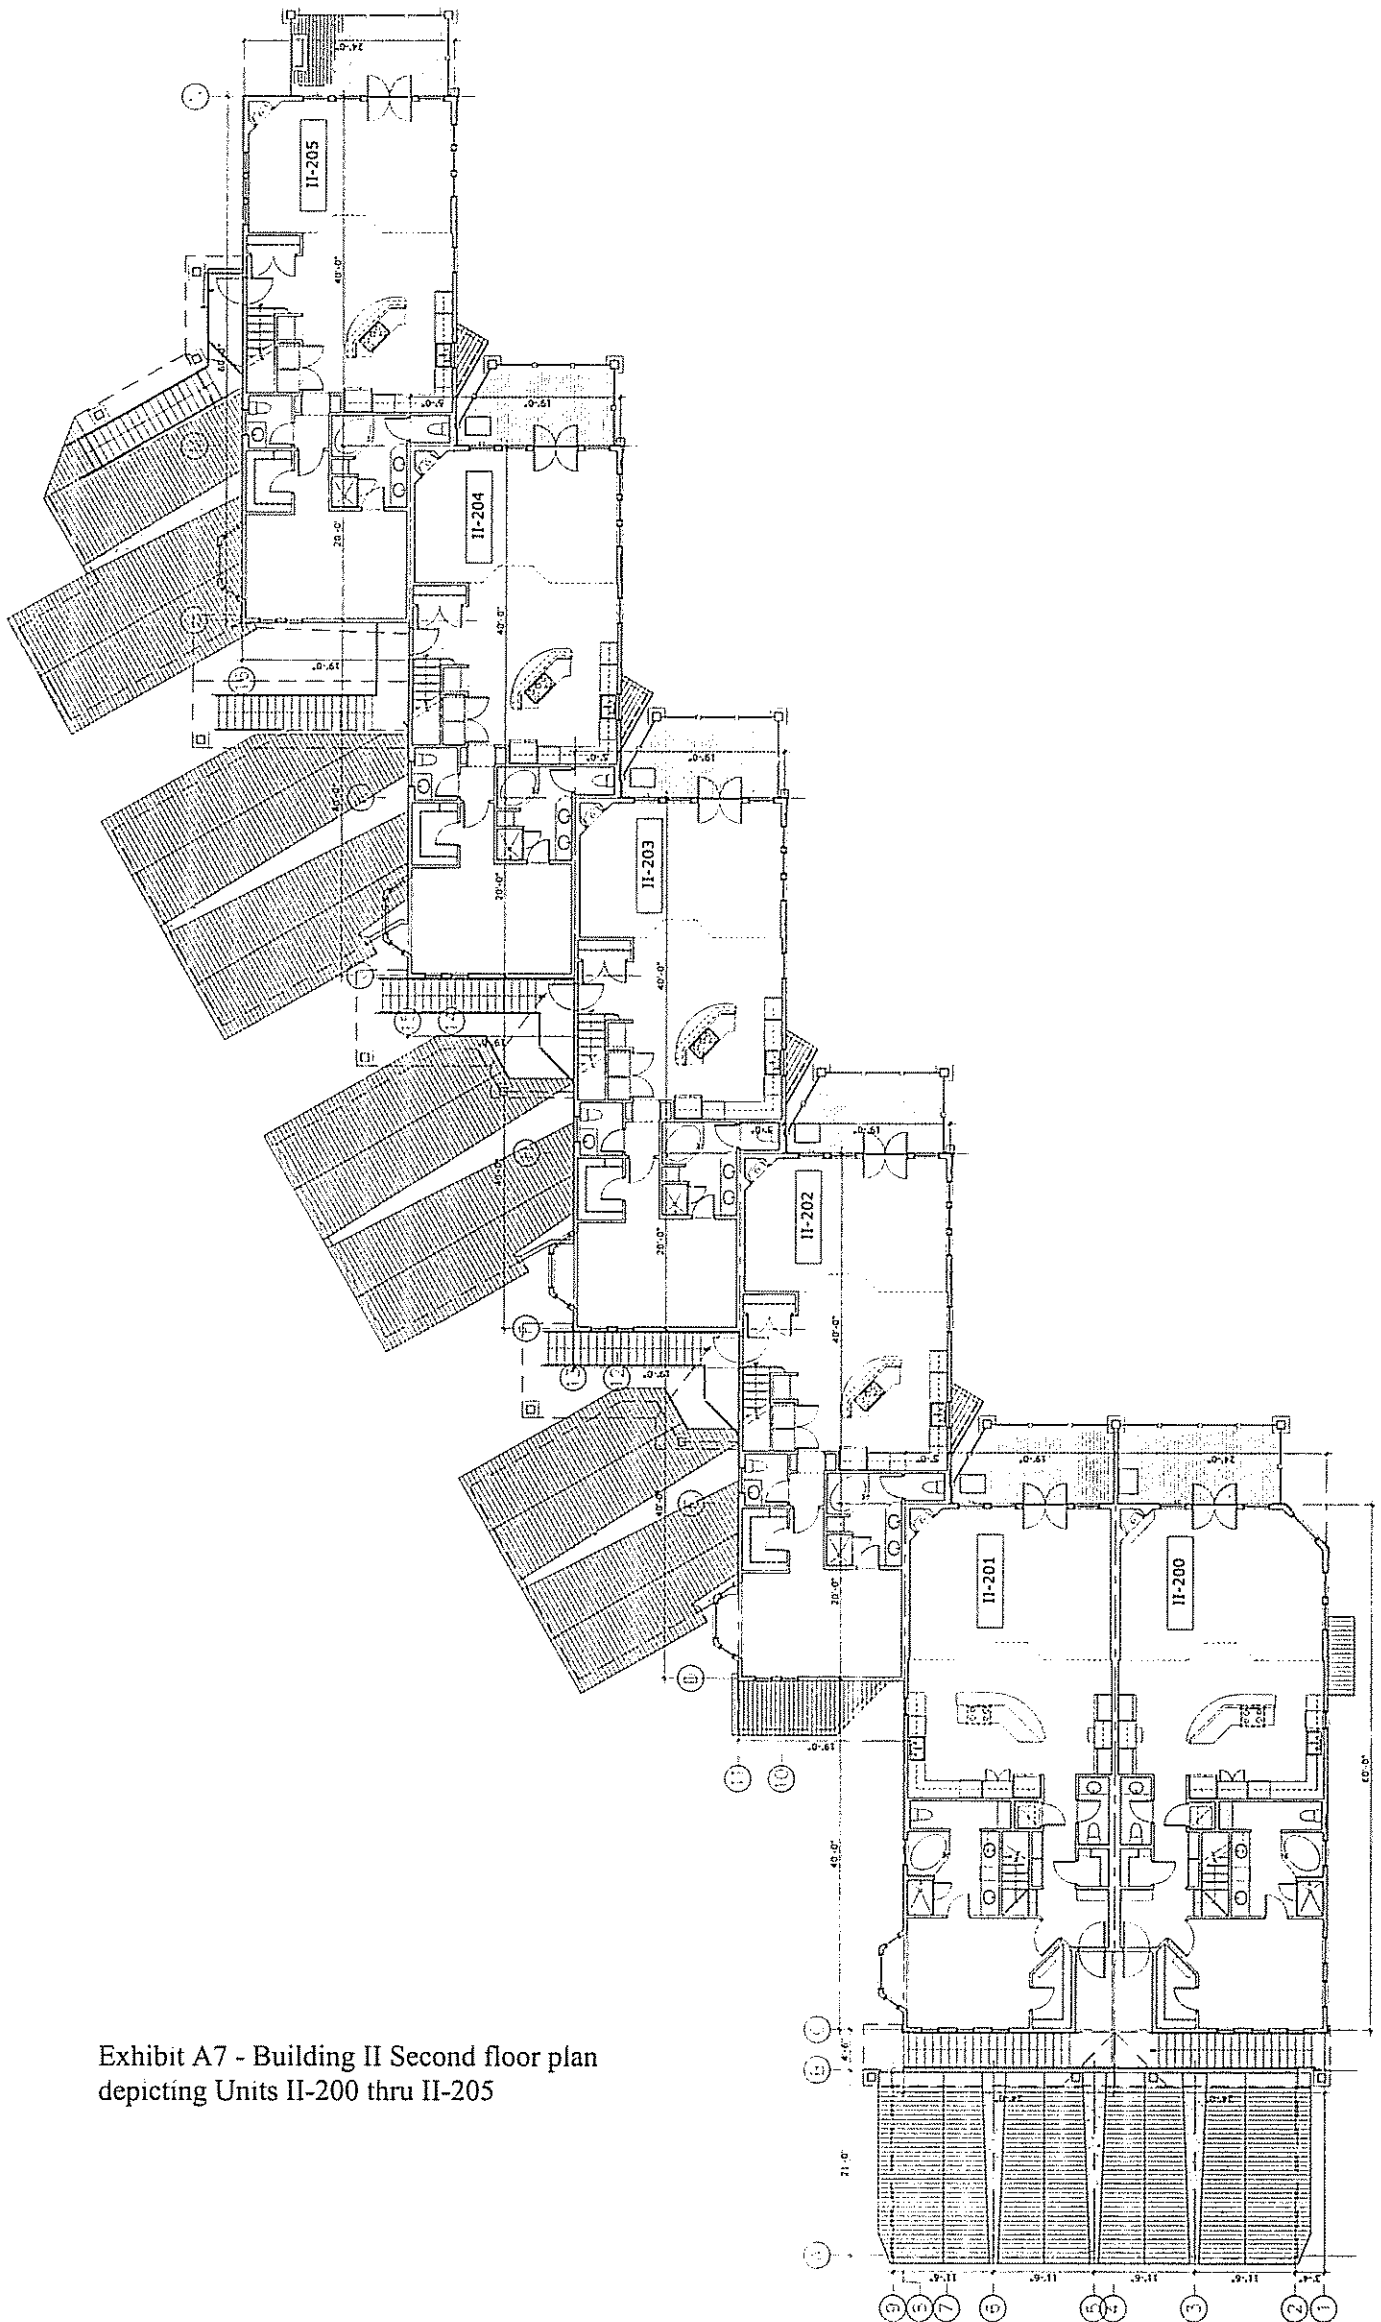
Building II Second floor plan depicting Units II-200 thru II-205
